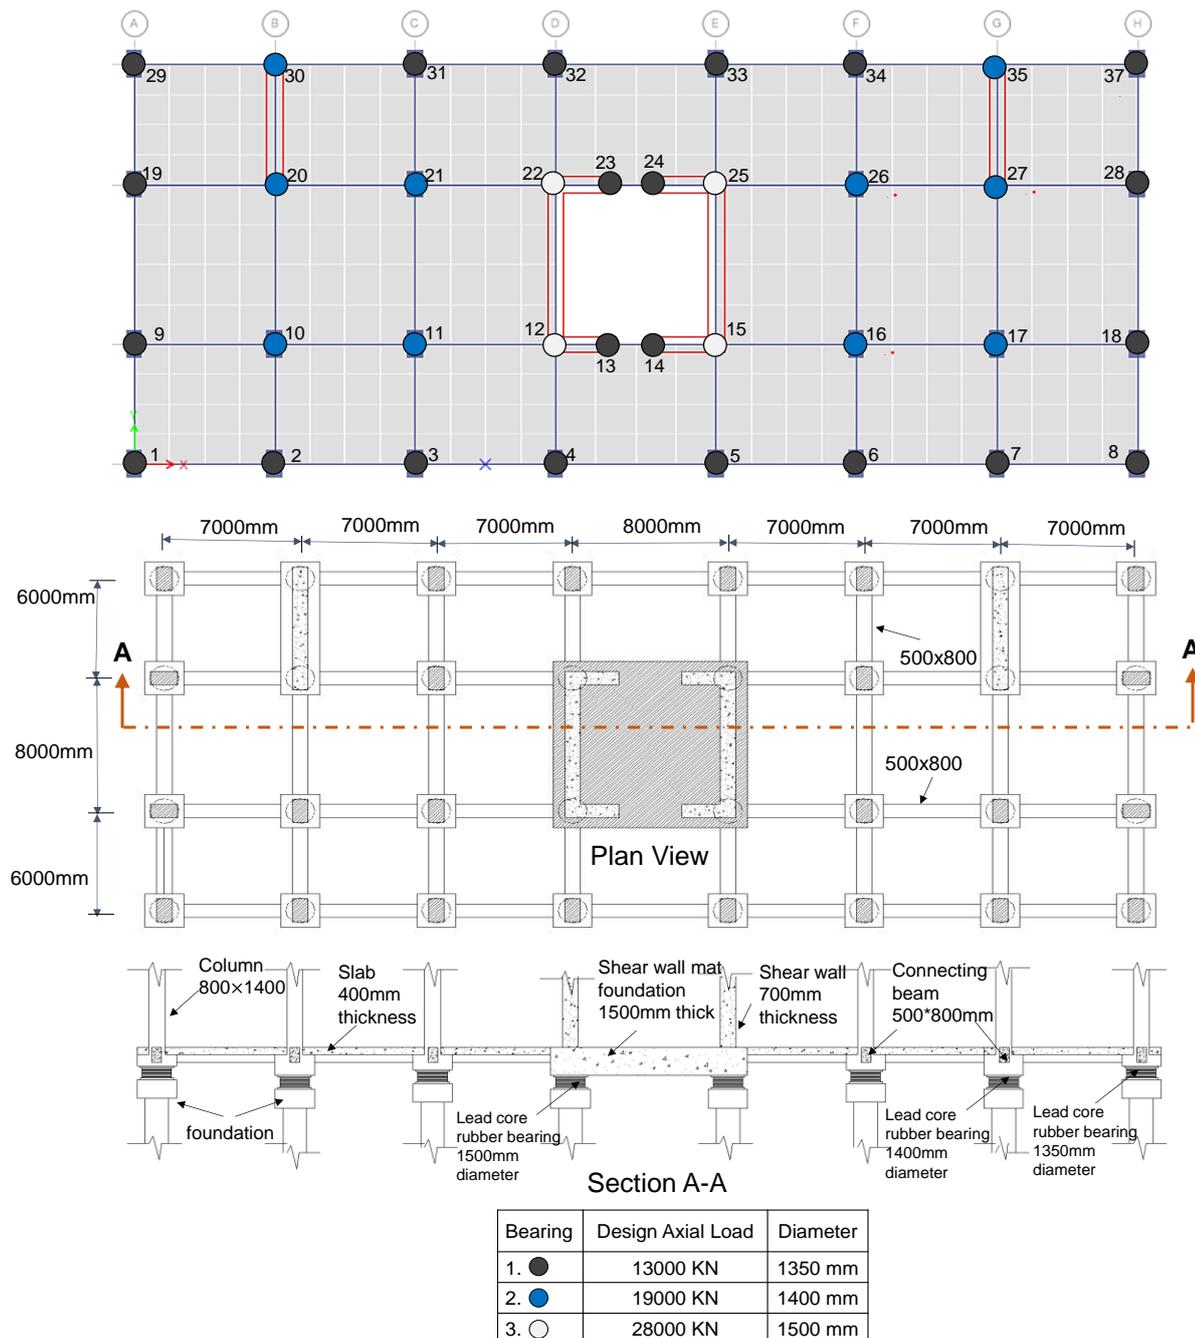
The layout of bearings with numbers in structural plan view and the section view at isolation level
